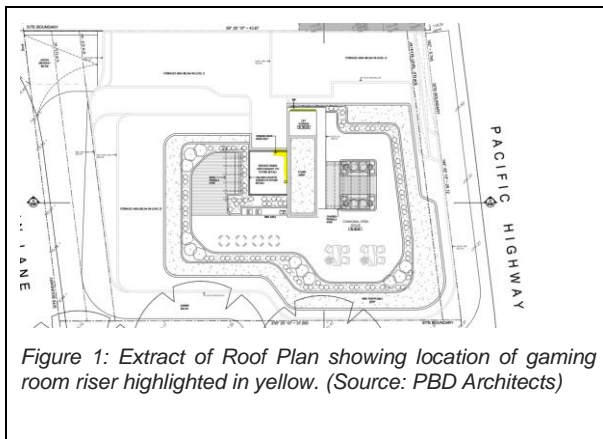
Extract of Roof Plan showing location of gaming room riser highlighted in yellow. (Source: PBD Architects)
